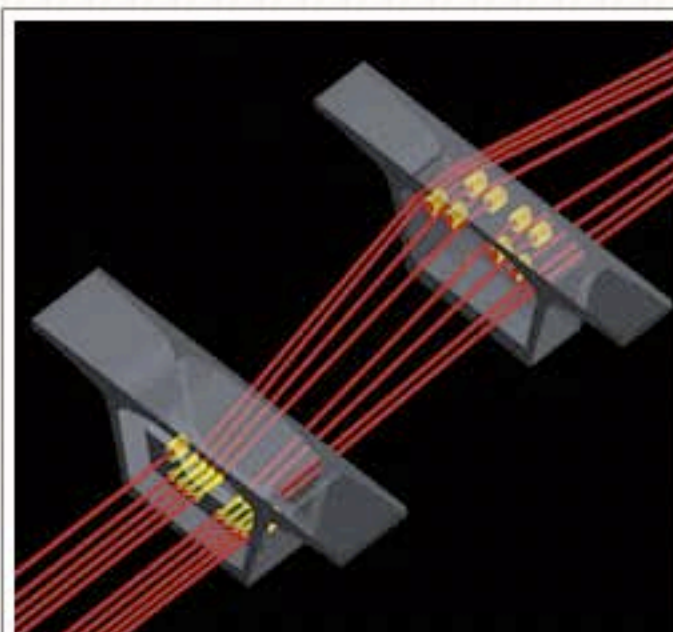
Tendon layout Road 431 Bridge (photo courtesy of FEG).
